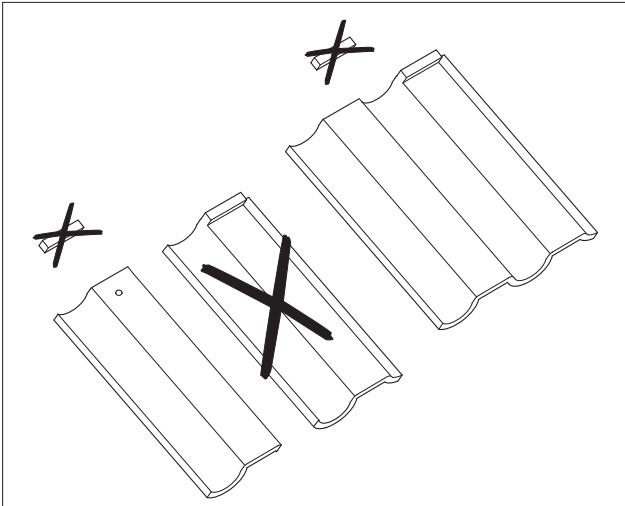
Along the side panels, the retaining edge of the roofing tiles may have to be removed; lateral size reduction may be required.
